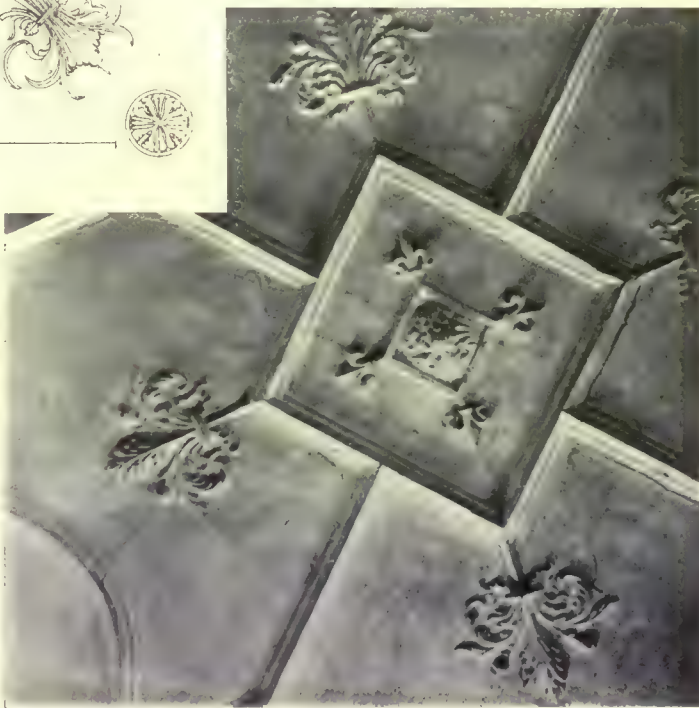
Portion of a Ceiling, Second Floor, over Entrance Gateway, Haddon Hall, Derbyshire.
